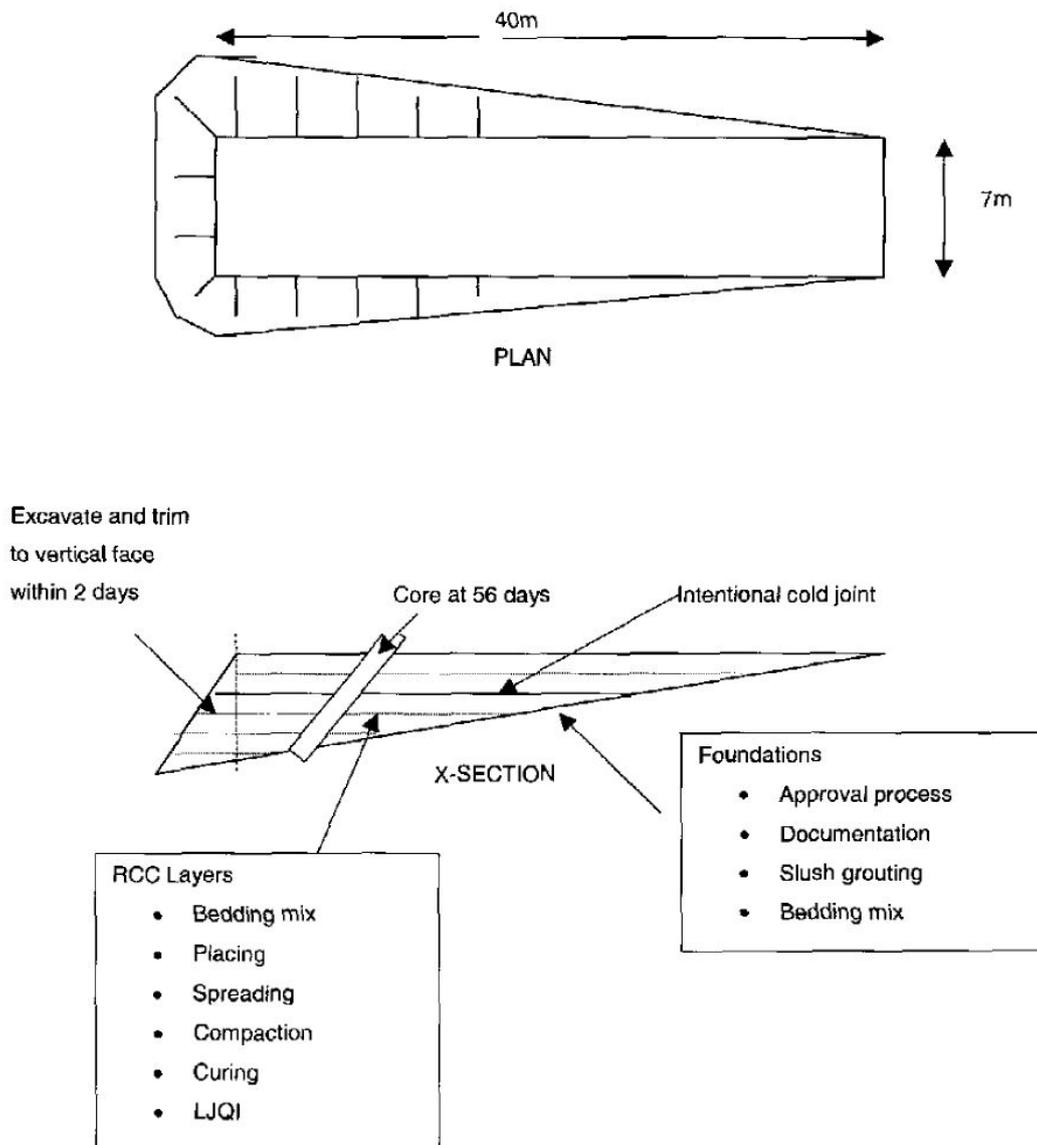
Trial embankment proposed by Mr Brett. (Exhibit 273, DNR.020.016.5720, .5724)
